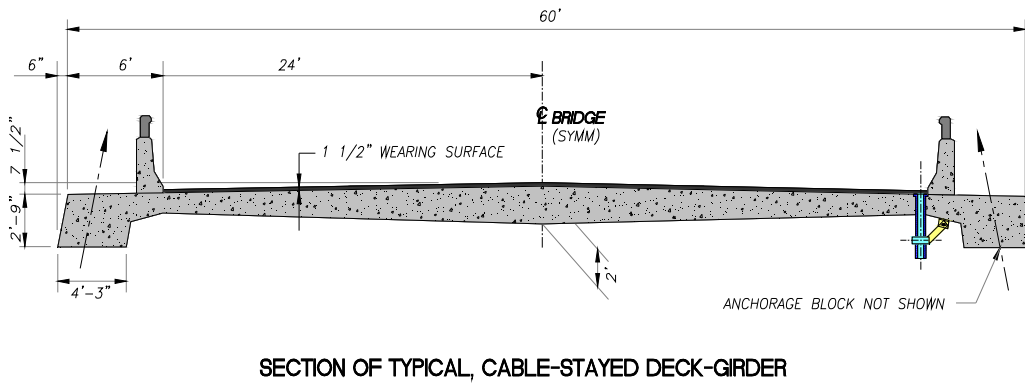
A typical cross-sectional view of the 2000' long, cast-in-place, cable-stayed deck girder
